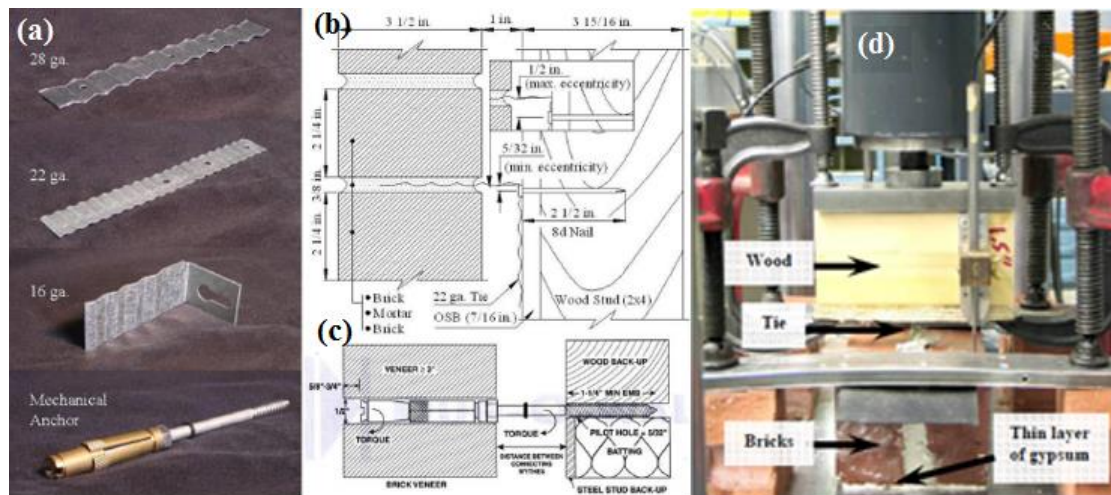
Subassemblies subjected to compression-tension loads: (a) corrugated sheet metal ties of three different thicknesses; (b) tie connection installation details; (c) mechanical repair anchor installation details; (d) setup configuration [14]
